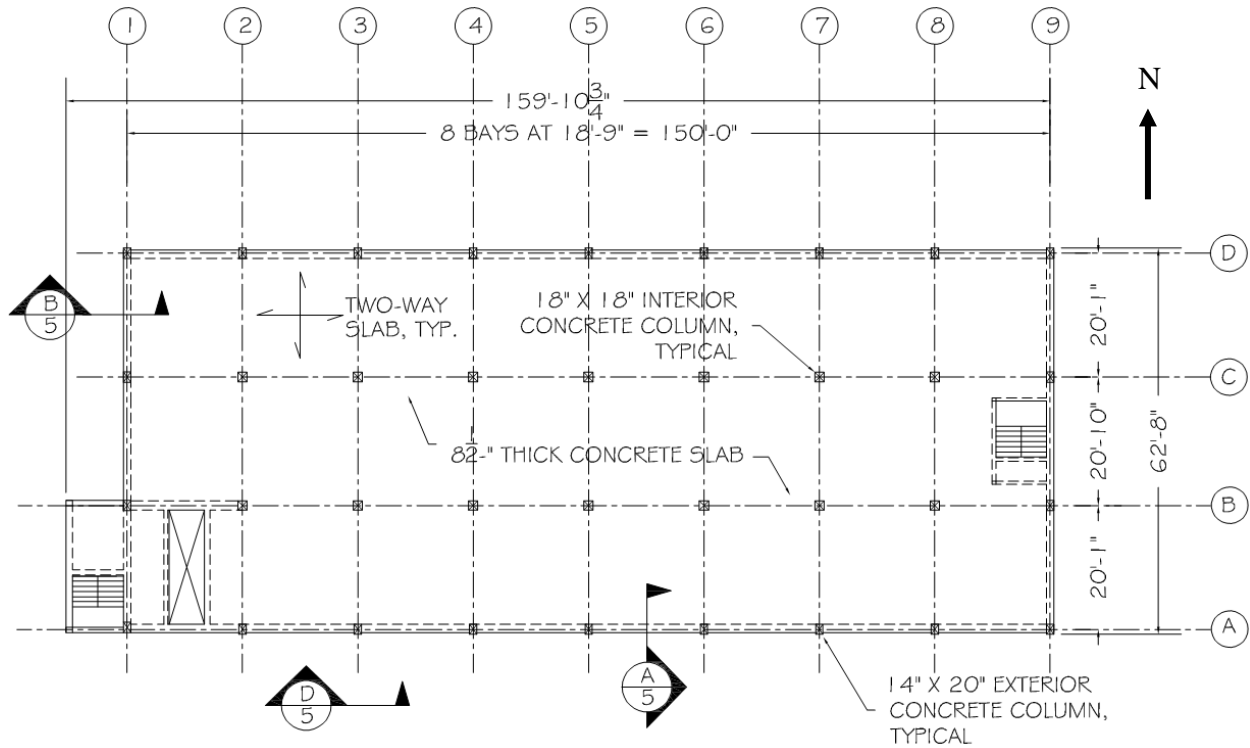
Typical Floor Plan (Rissman & Rismann Associated Ltd., 1965)
